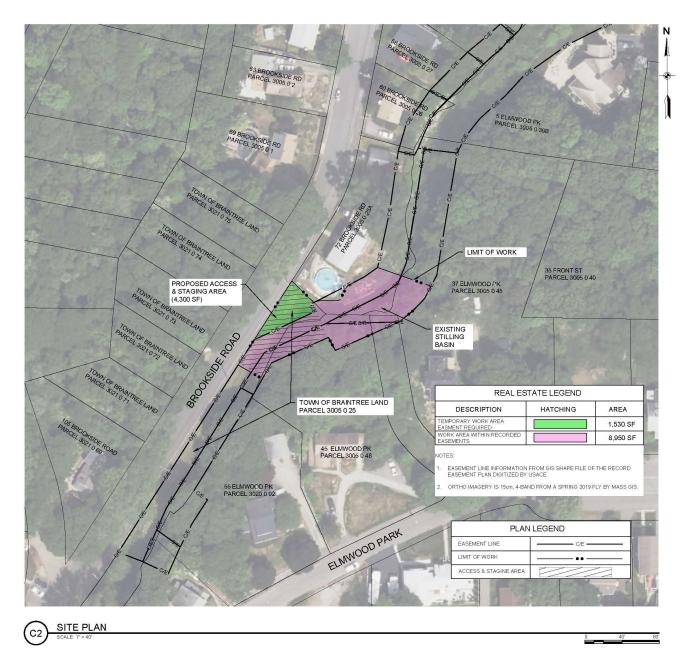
The Proposed Alternative for the Fish Ladder Construction
